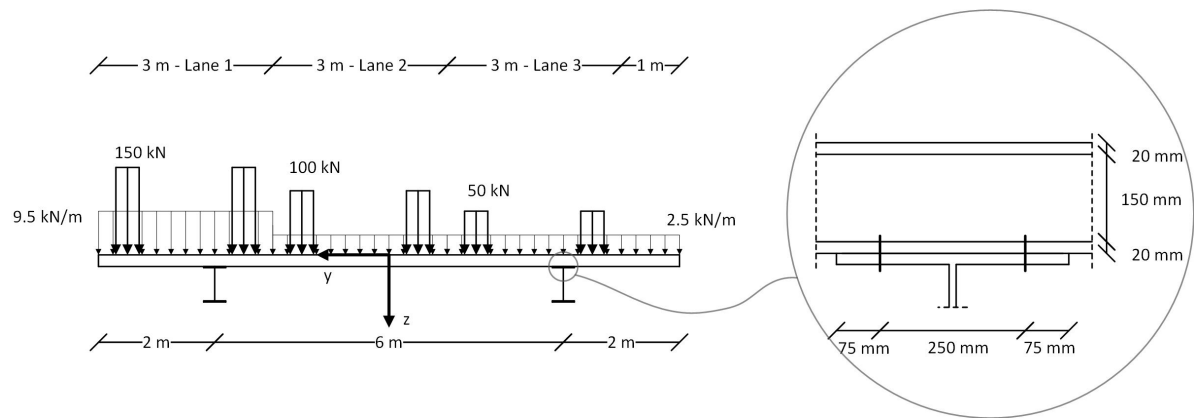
A side view of the benchmark bridge load with load model 1 (LM1).
